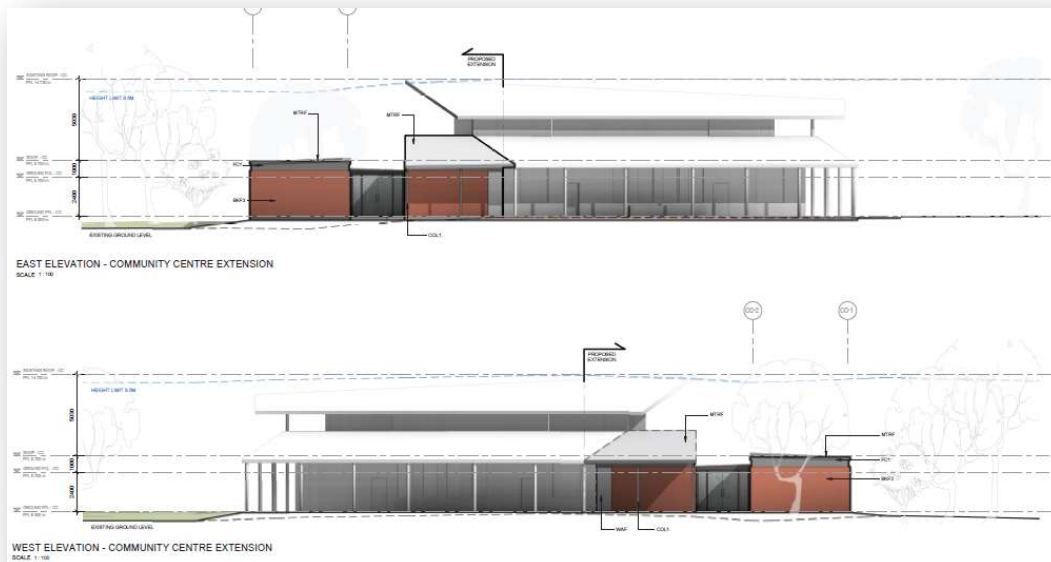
Elevations Plan (Drawing DA-CC-30-02) showing the east and west elevations of the Cultural Centre extension (Source: Cox Architecture 2022)
